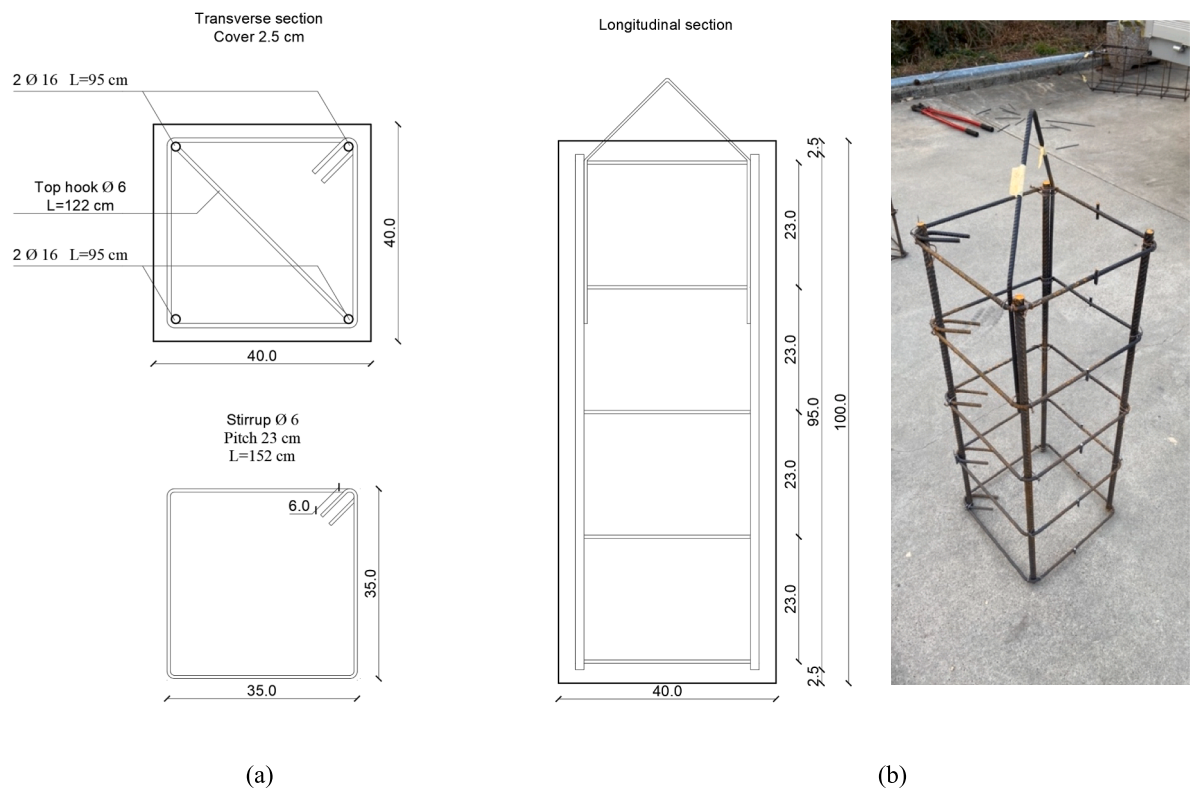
Column specimen: (a) cross- and longitudinal sections; (b) photograph of the reinforcement cage.
